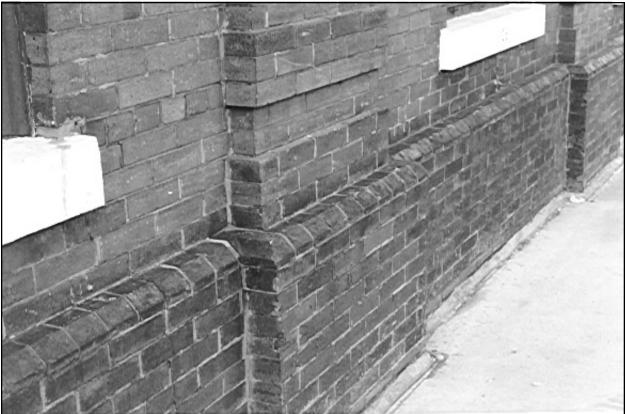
Drainage Pumping Station No. 1. View of east facade pilaster base, showing course of beveled bricks.
